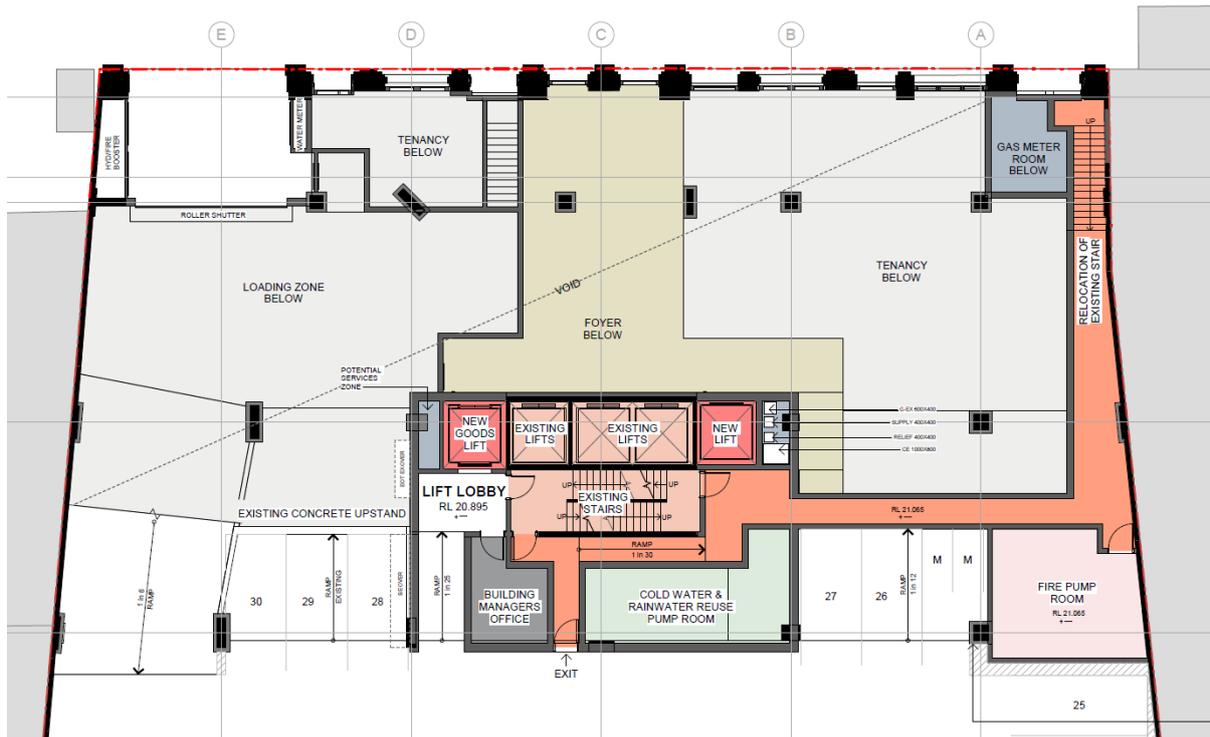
Amended mezzanine floor plan omitting the plate steel lining to Kent Street
